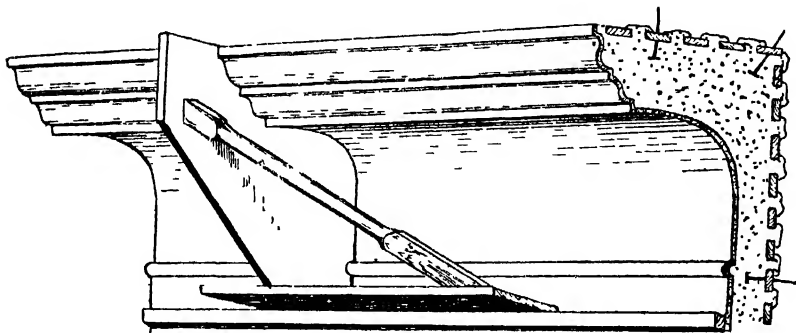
,526 —Detail of mould with arm and guide arranged to slide on moulding strip.
